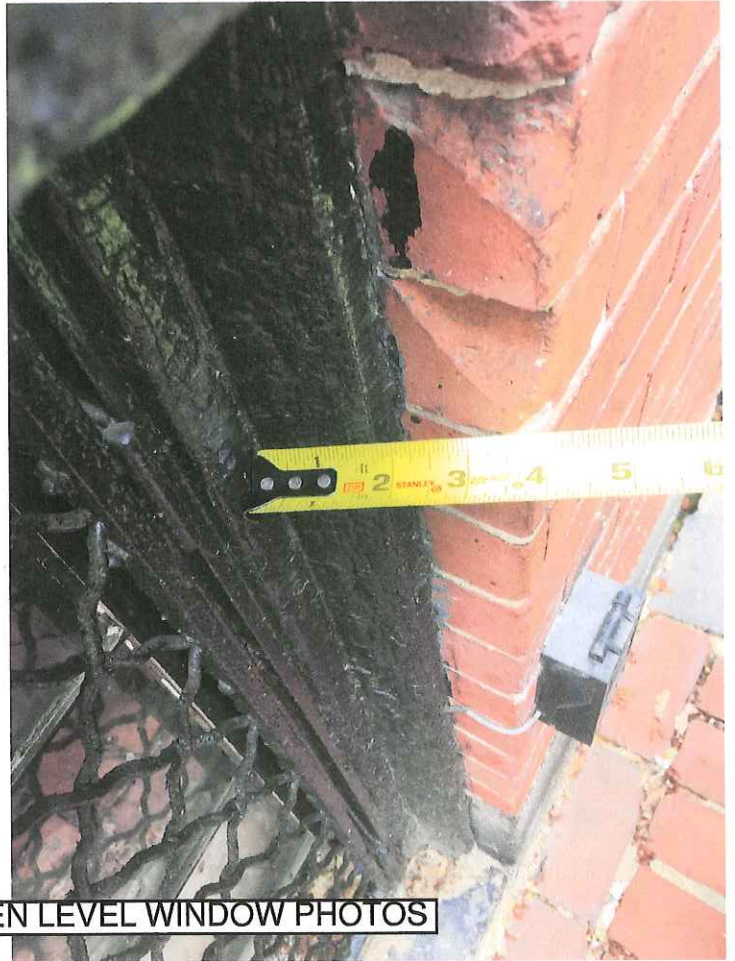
TYPICAL 6 OVER 6 WINDOW DETAIL
